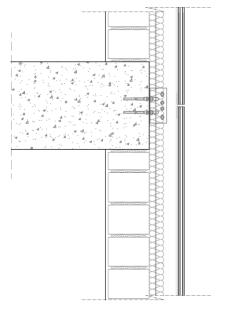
Vertical section. Faveton® SAH Acqua 20-V.
